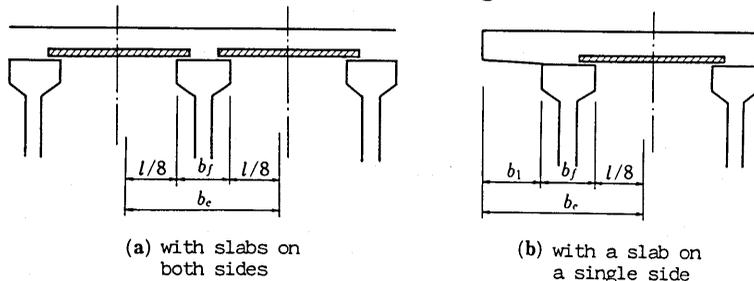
Effective width as the compression flange in a composite girder with concrete girders
